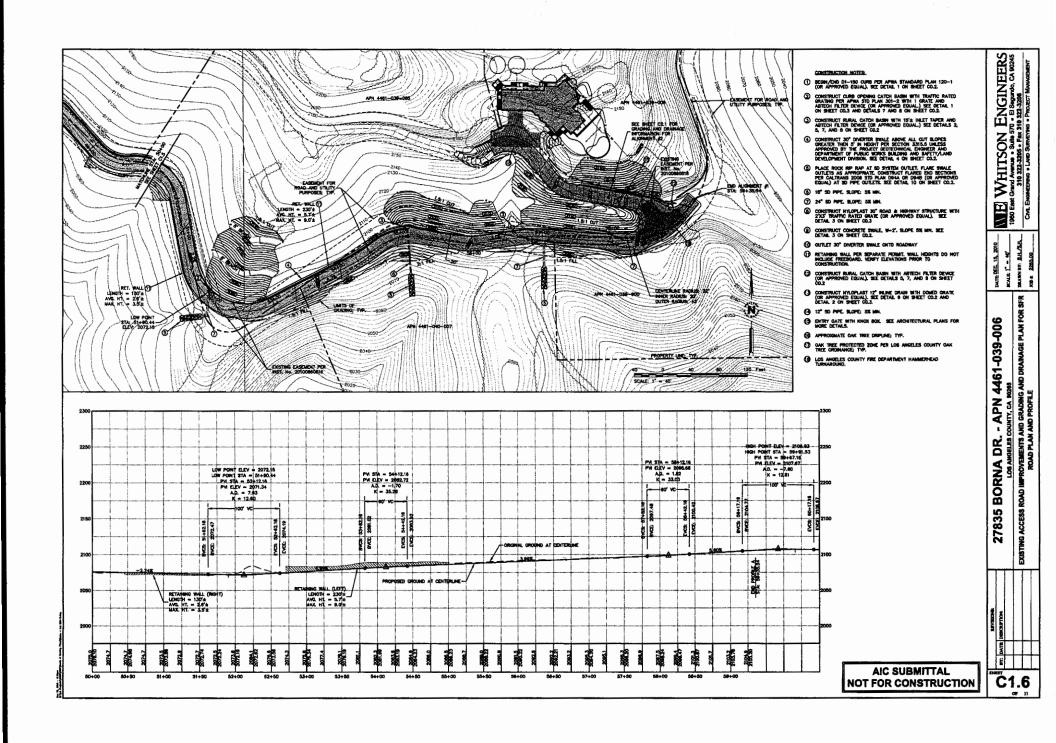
CDP 4-10-104 Proposed Access Road Plans
